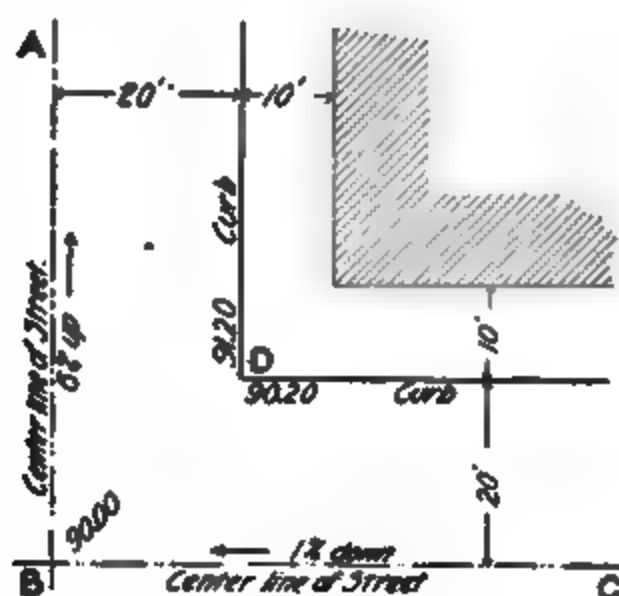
GRADE OF CURB AT STREET INTERSECTION.
